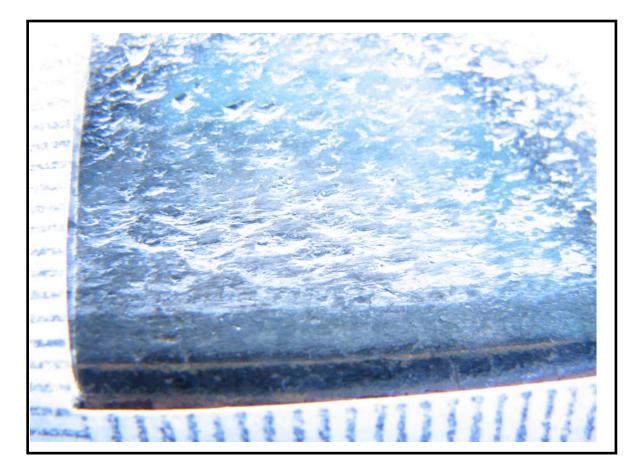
A close-up photograph of side wear on an un-lubricated rail. Note the scouring marks left by passing wheel flanges. The measurement markings at the side and bottom are 1 mm apart.
